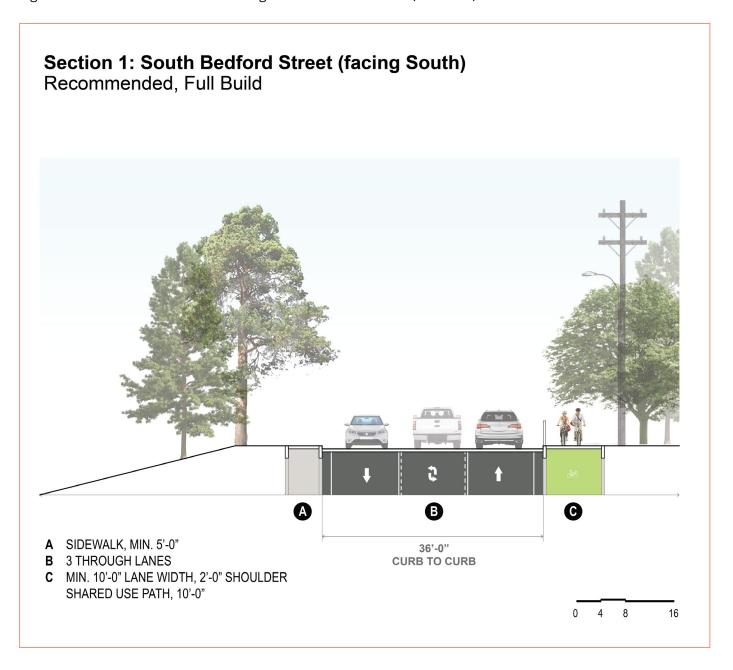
South Bedford Street Existing and Future Conditions (Section 1)
